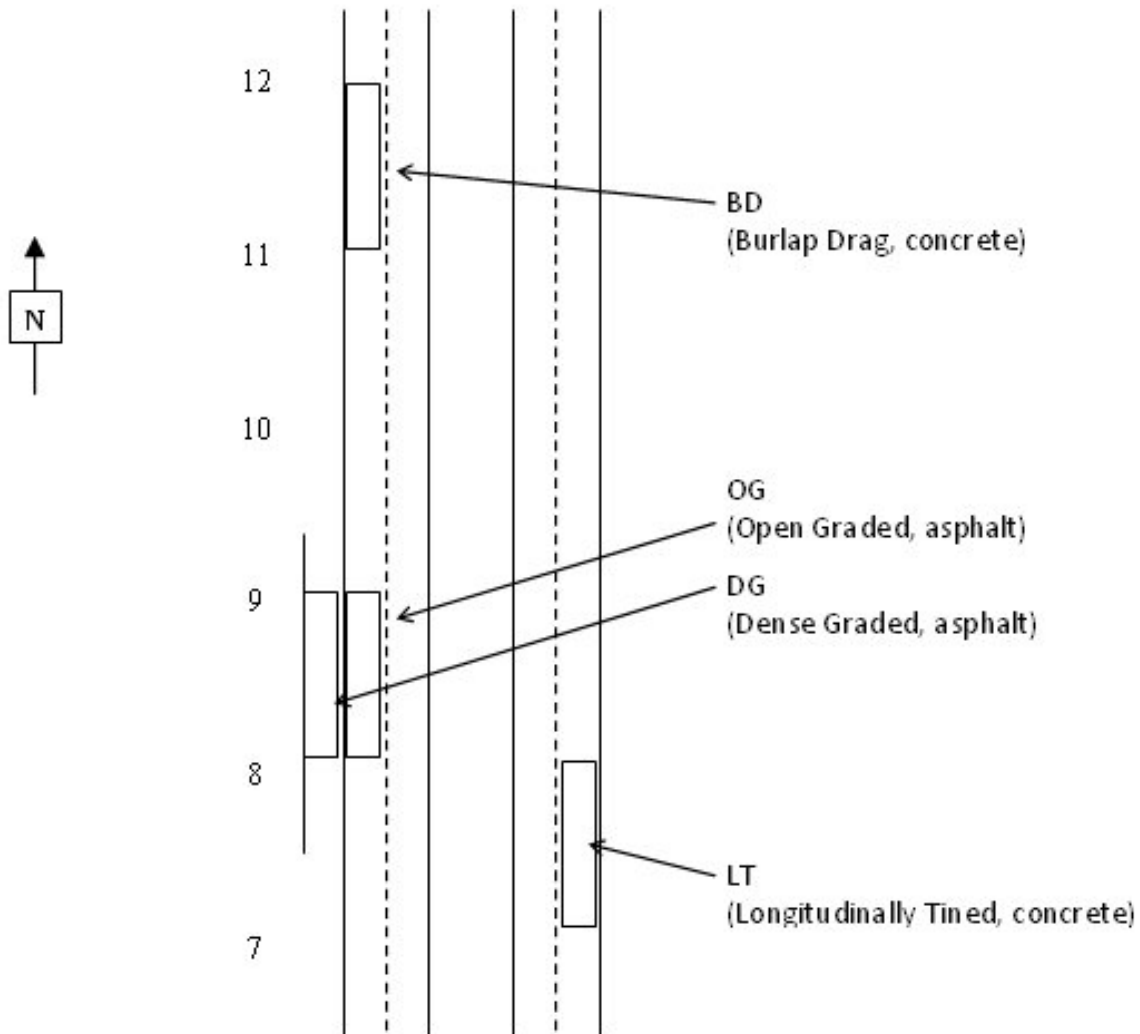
Schematic location of pavement sections (post-miles shown on left side).
